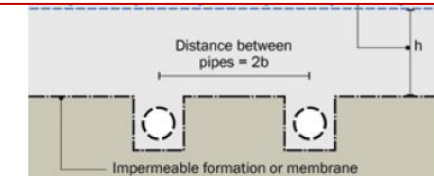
Outfall pipe spacing (after Interpave, 2010)
